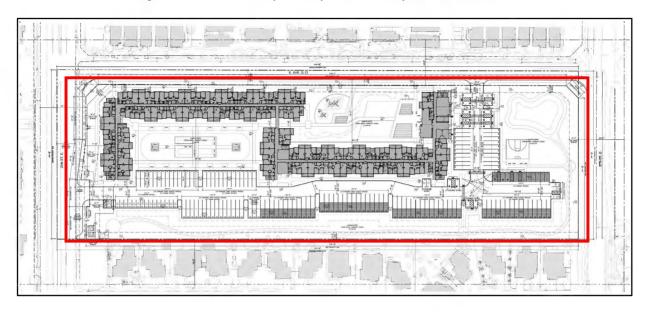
Site Plan - Proposed Apartment Complex - Palmdale, CA
